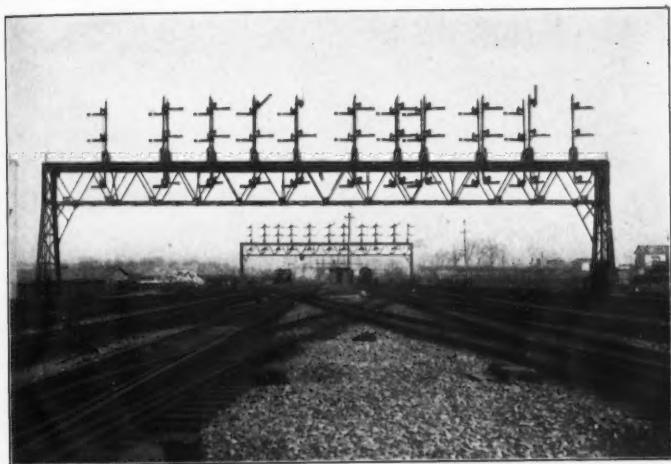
WASHINGTON TERMINAL STATION: SIGNAL BRIDGE AT DIAMOND CROSSING.
